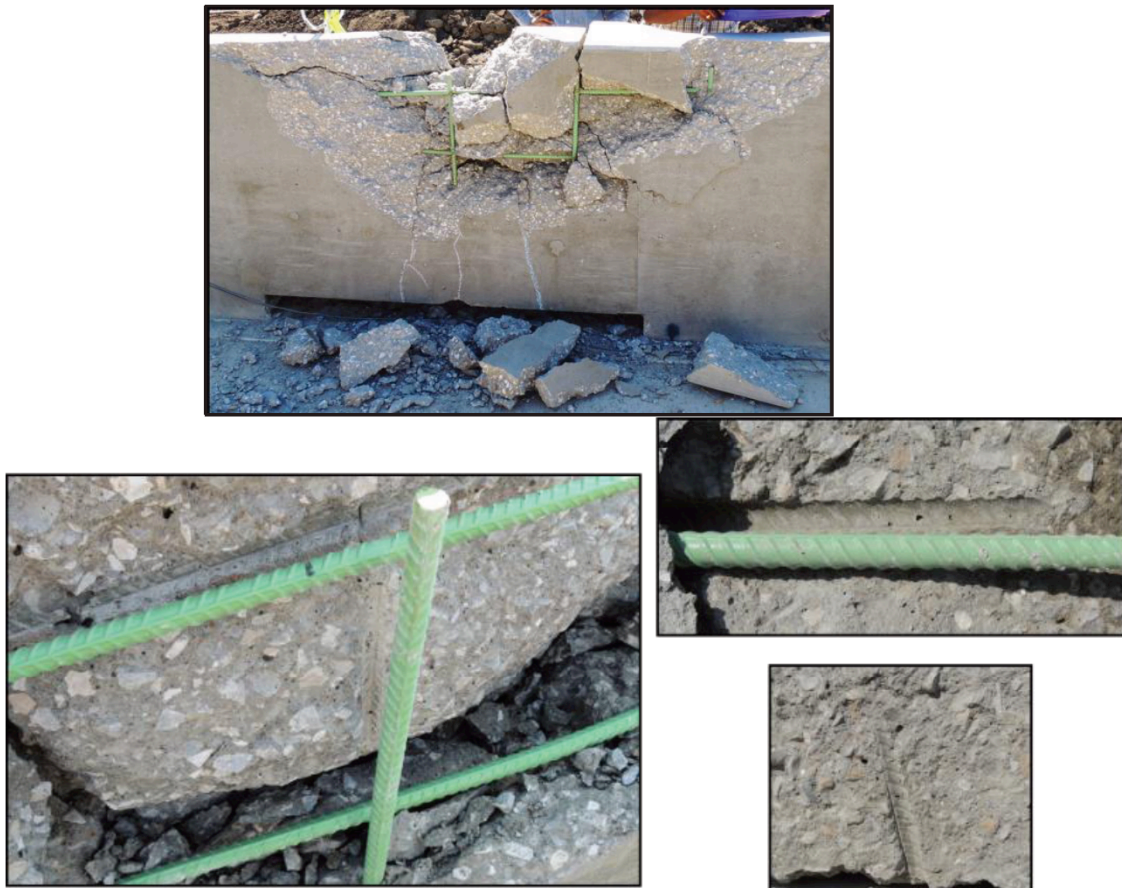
The failure mode of cast-in-place concrete barriers after impact loading.
